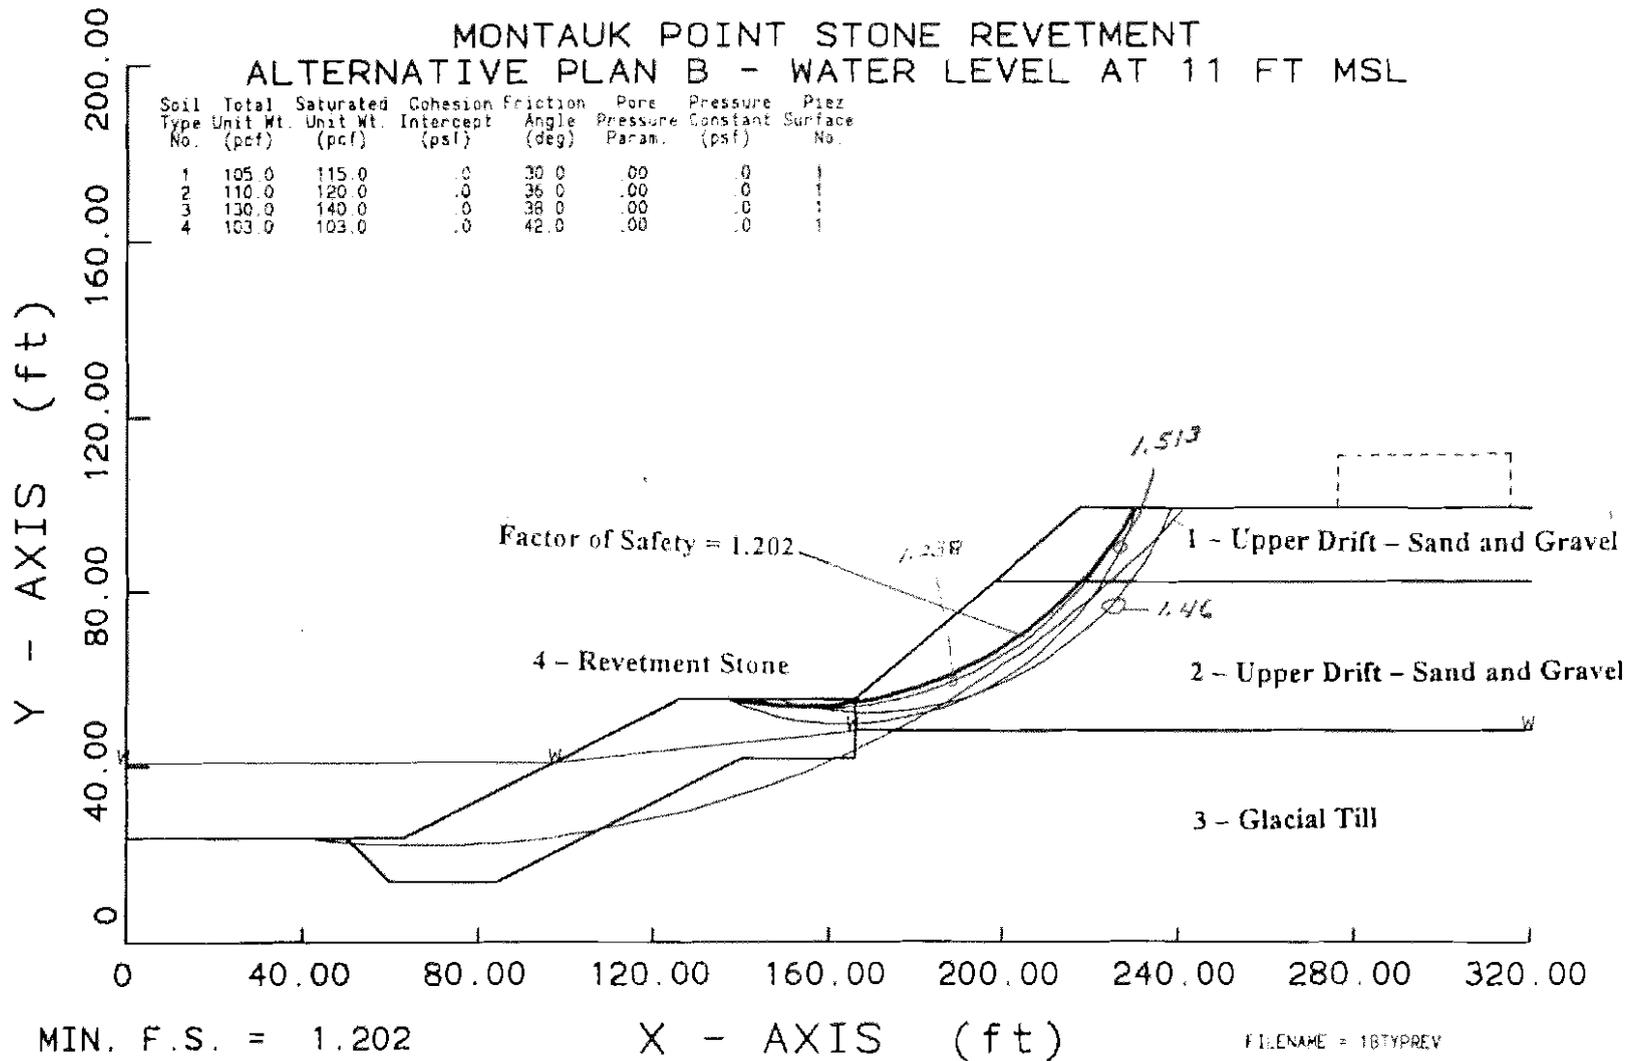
Slope Stability Analysis for Stone Revetment Alternative "B"
